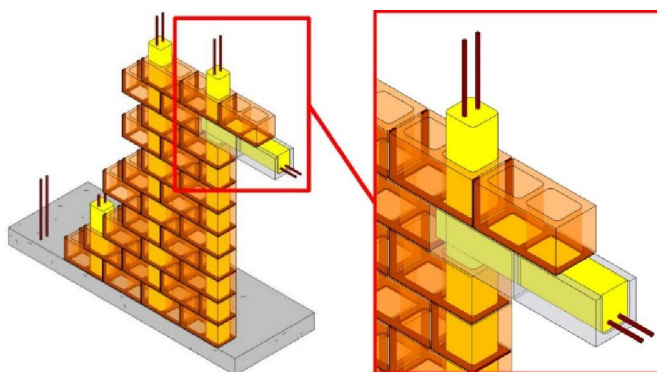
BIM detail: interior masonry wall at LOD 400 (retrieved from [19]).
